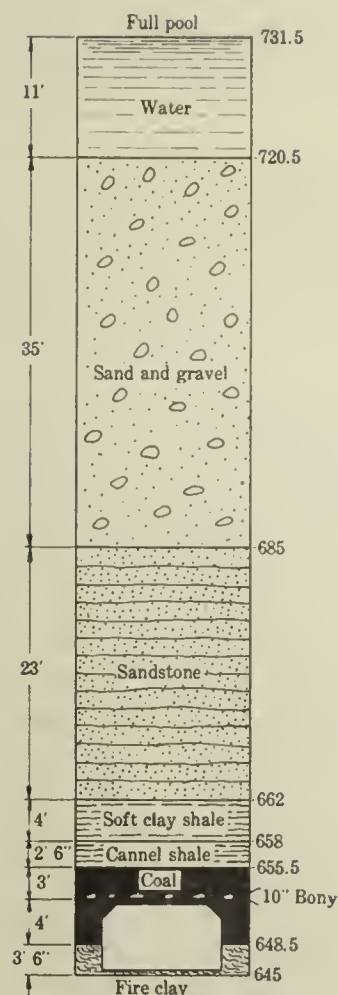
TYPICAL CROSS SECTION OF ONE OF THE TUNNELS AND THE ROOF UNDER THE RIVER
